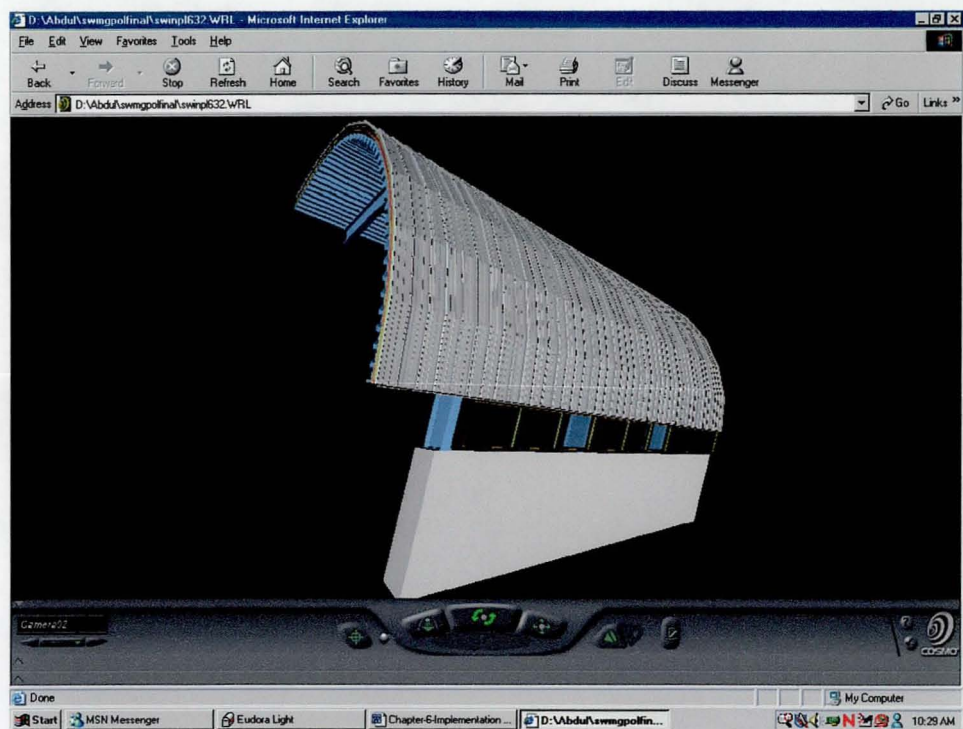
VRML model showing how cladding, insulation, glazing and beams interface in the swimming pool building
